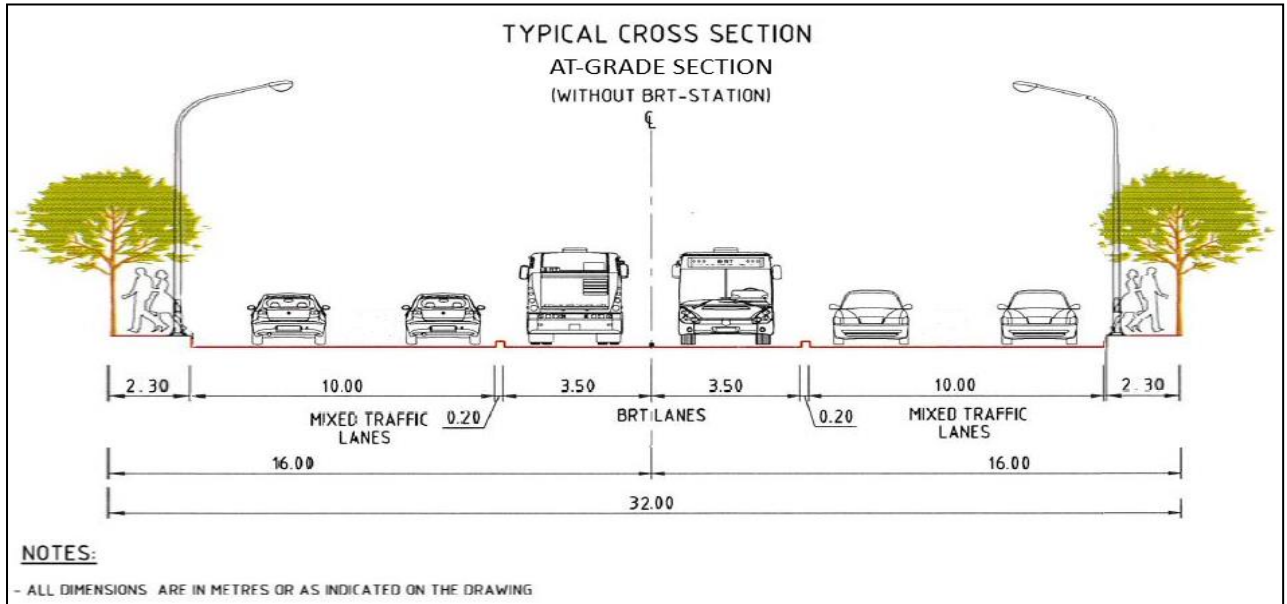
Proposed BRT Cross Section of Roadway to be implemented (without station)
